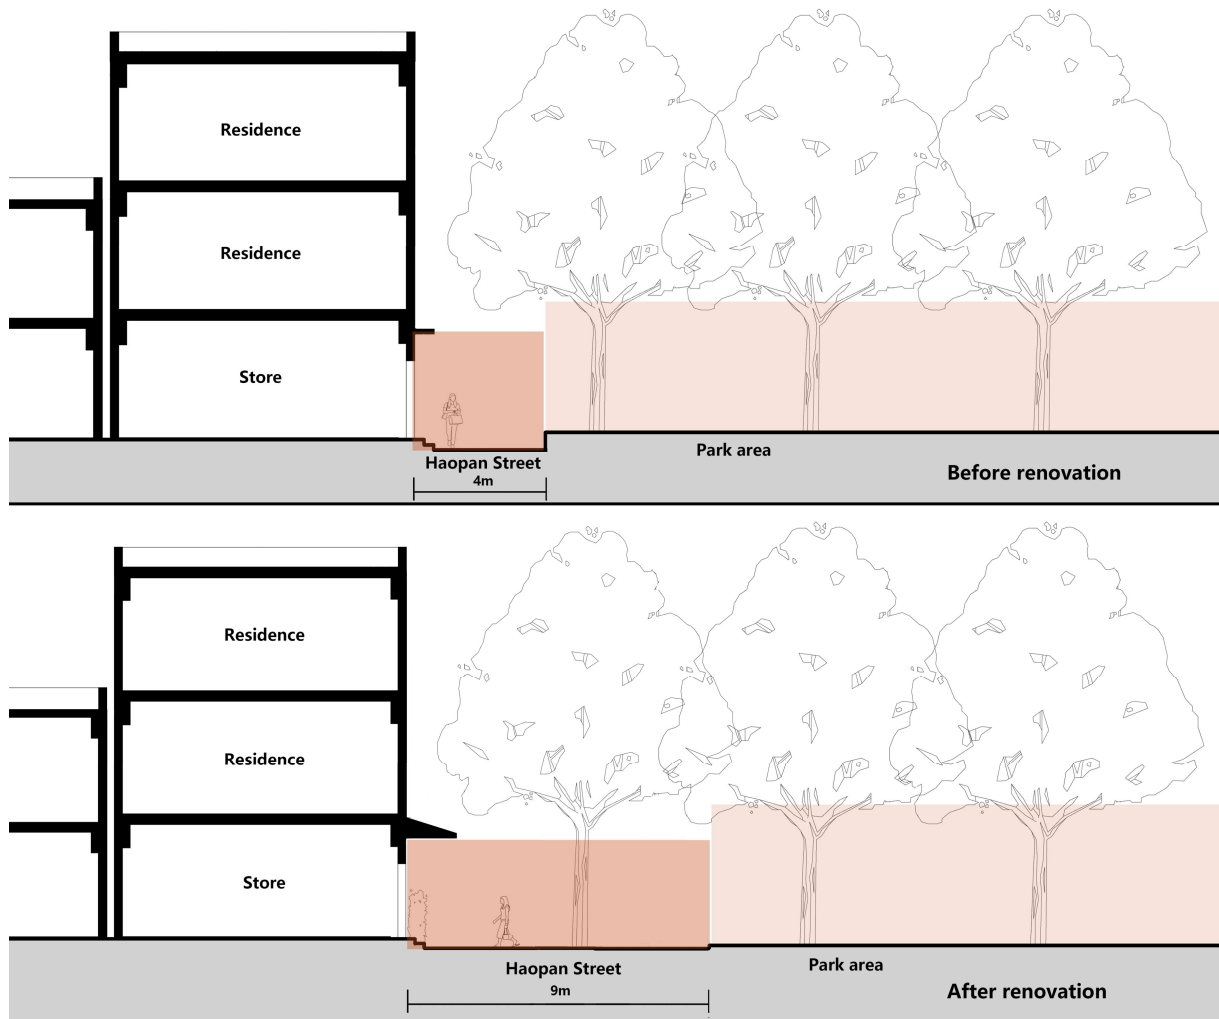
Street Node 2 Pre - and Post Renovation Sectional View
